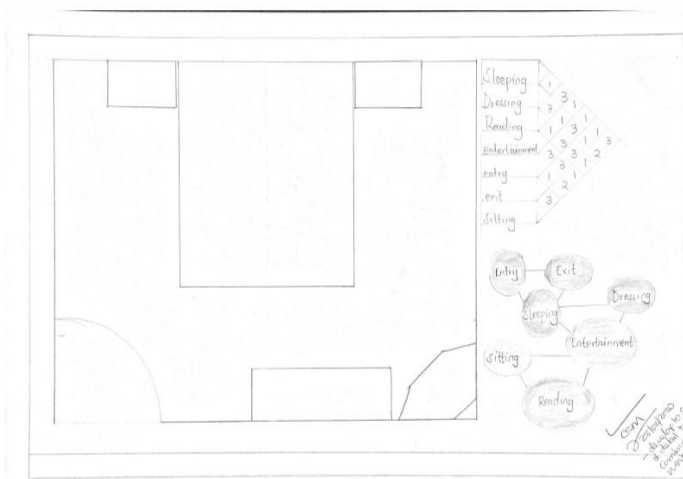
6 A sketch of proposed guest bedroom layout, Source: (Author, 2020)
